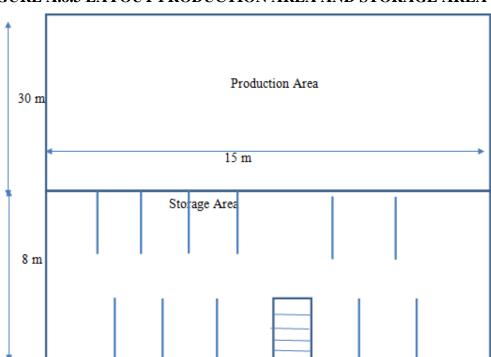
LAYOUT PRODUCTION AREA AND STORAGE AREA²²
